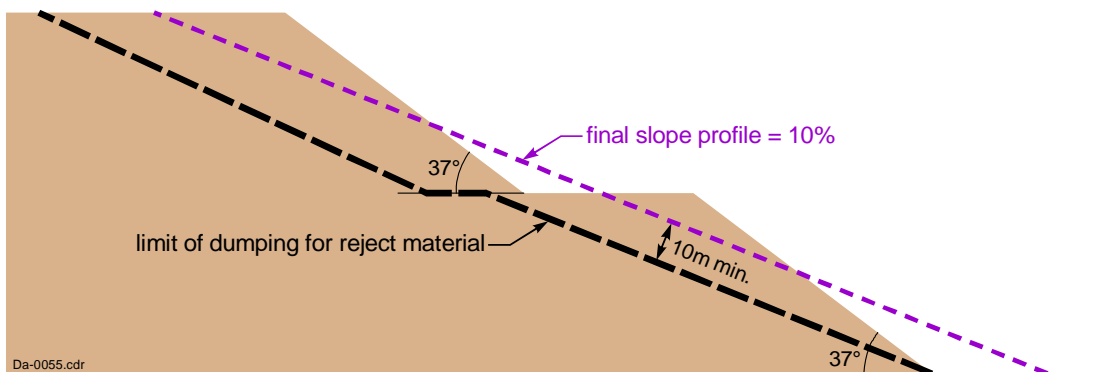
Cross section of typical spoil dump showing minimum 10m cover over Coal Rejects and dewatered tailings material
